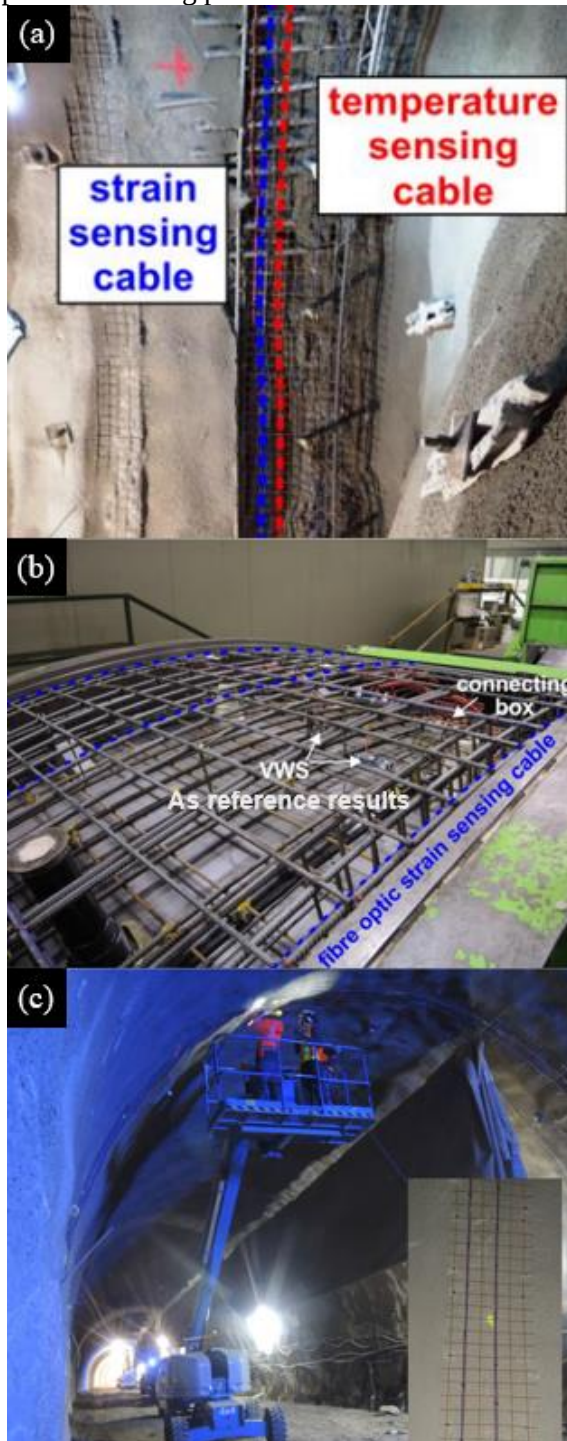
Typical embedding position of DFOS sensors, (a) in shotcrete lining, (b) in tunnel segments and (c) along the shotcrete lining.
